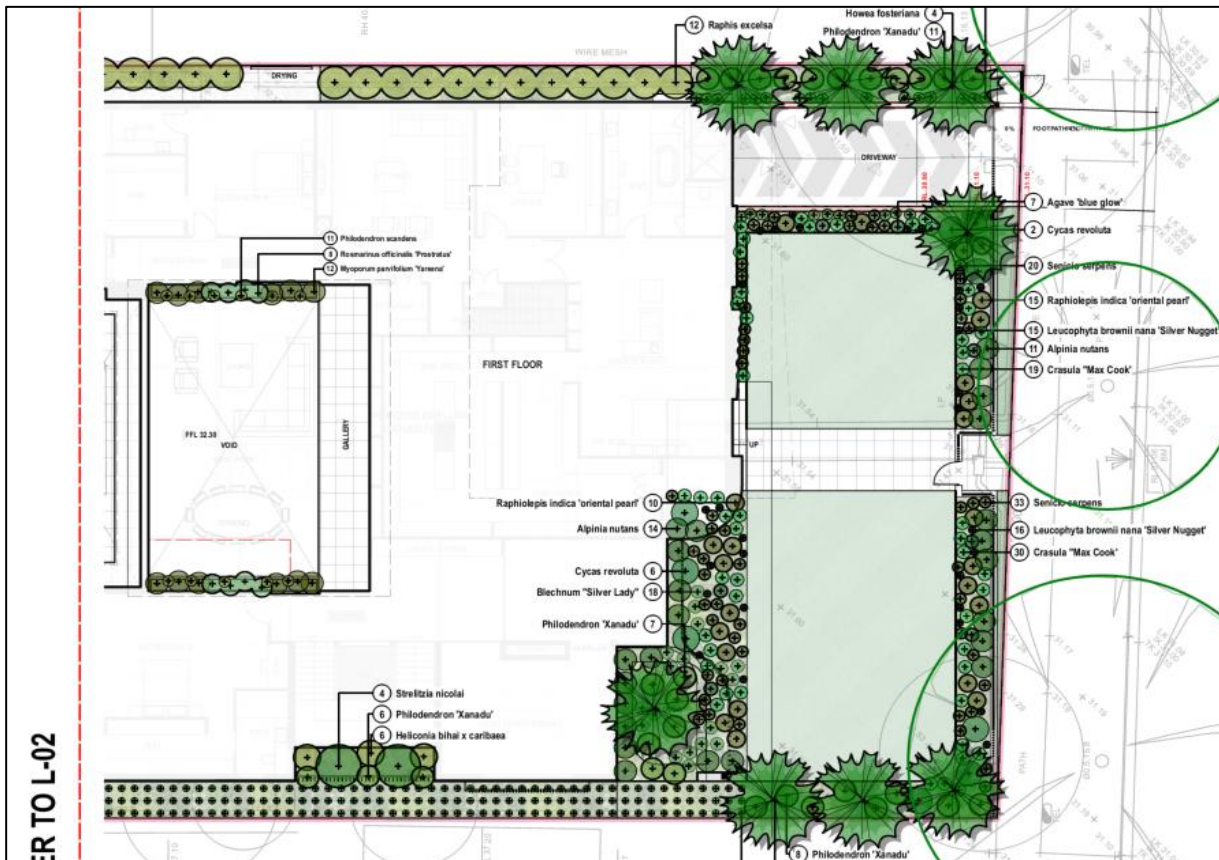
Extract of the applicant's submitted Landscape Plan.
